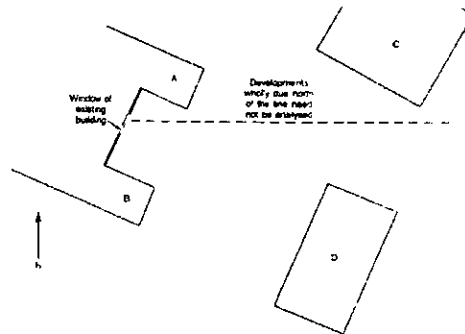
In analysing the sunlighting impact on the existing window, no check need be made for proposed extension A and new building C, as they lie within 90° of due north of the window. Proposed extension B should be checked, as should new building D if it subtends more than 25° to the horizontal, measured in section from the centre of the window
